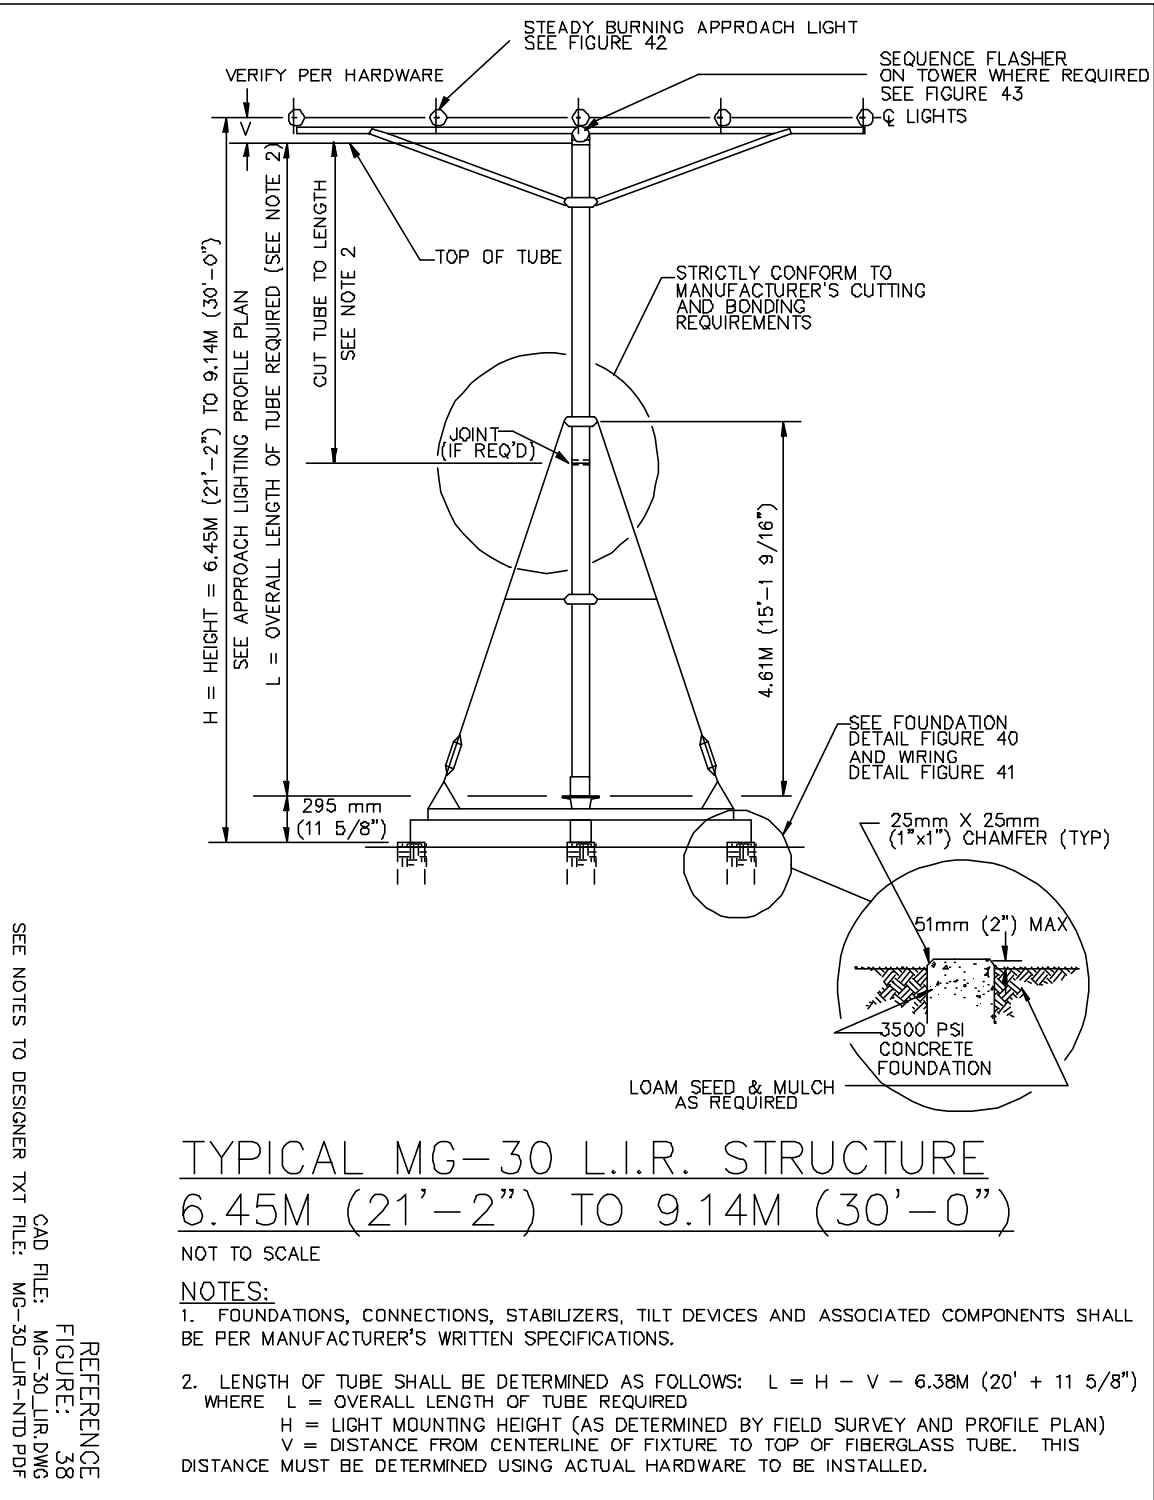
Typical MG-30 L.I.R. Structure 6.45M (21'-2") to 9.14M (30'-0")
